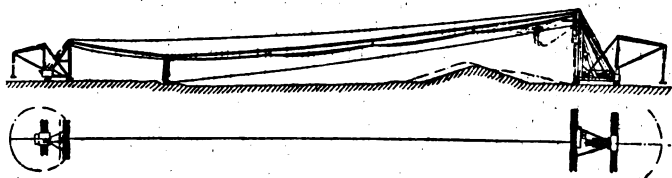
Lidgerwood Drag-Line Cableway Excavator Used in Vicksburg District to Build Mississippi Levees.
